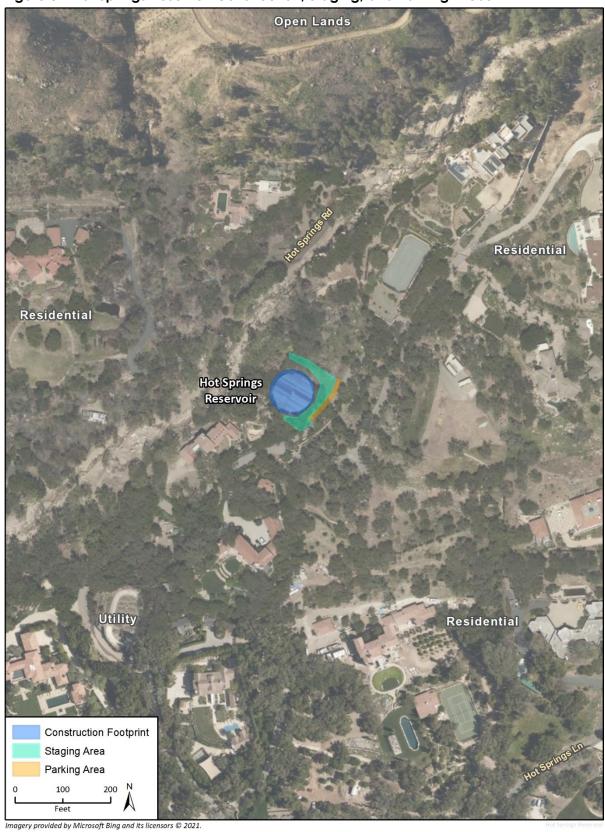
Hot Springs Reservoir Construction, Staging, and Parking Areas
